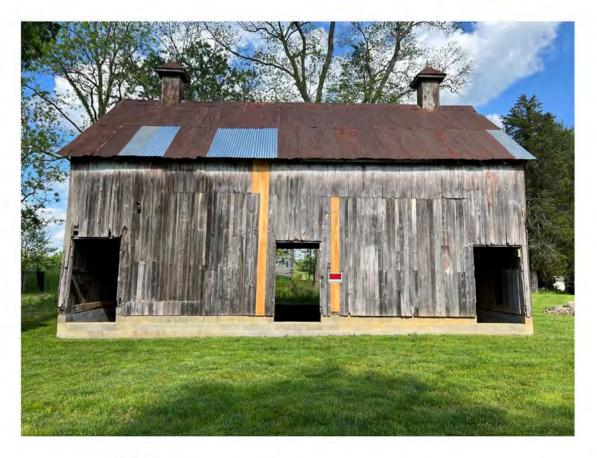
East Elevation: Three Open Barn Doorways; Proof-of-concept siding patching
